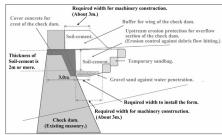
Example of Repair and reinforcement of an old existing masonry check dam. (Example of minimum safety control planning.)
